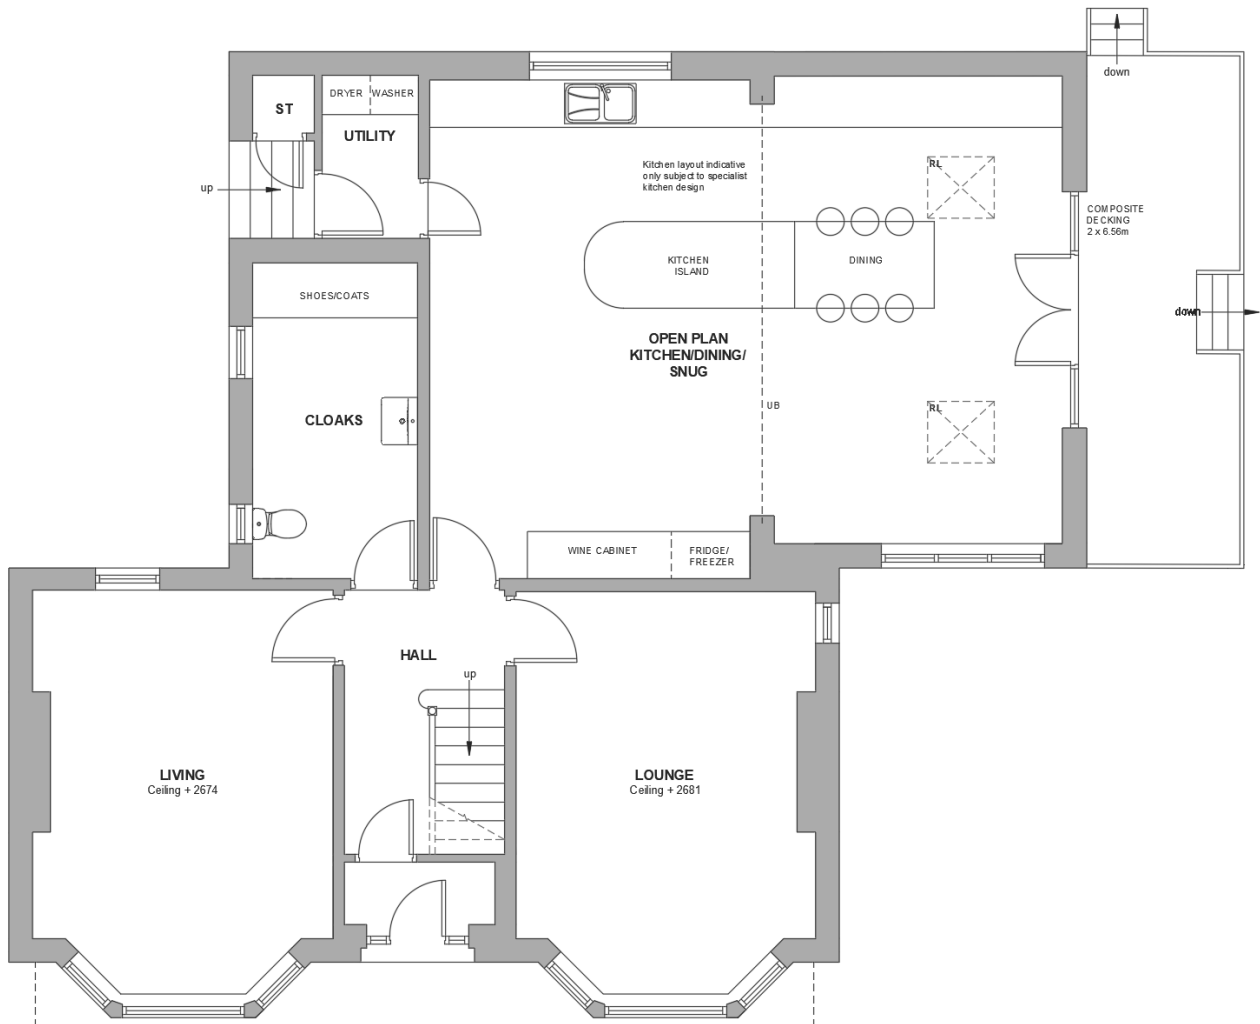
PROPOSED GROUND FLOOR PLAN
